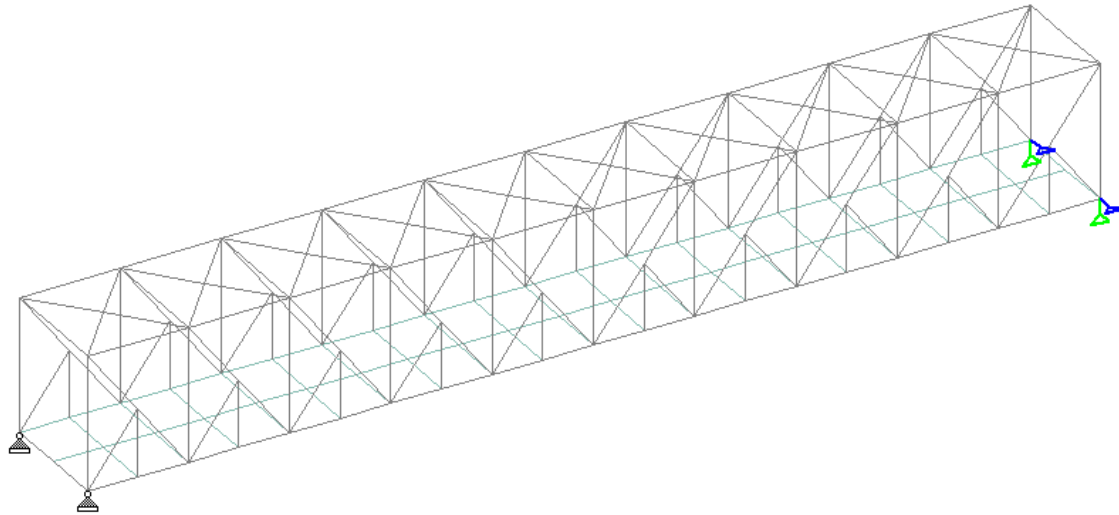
STAAD model for through type and deck type 60.0m span bridges
